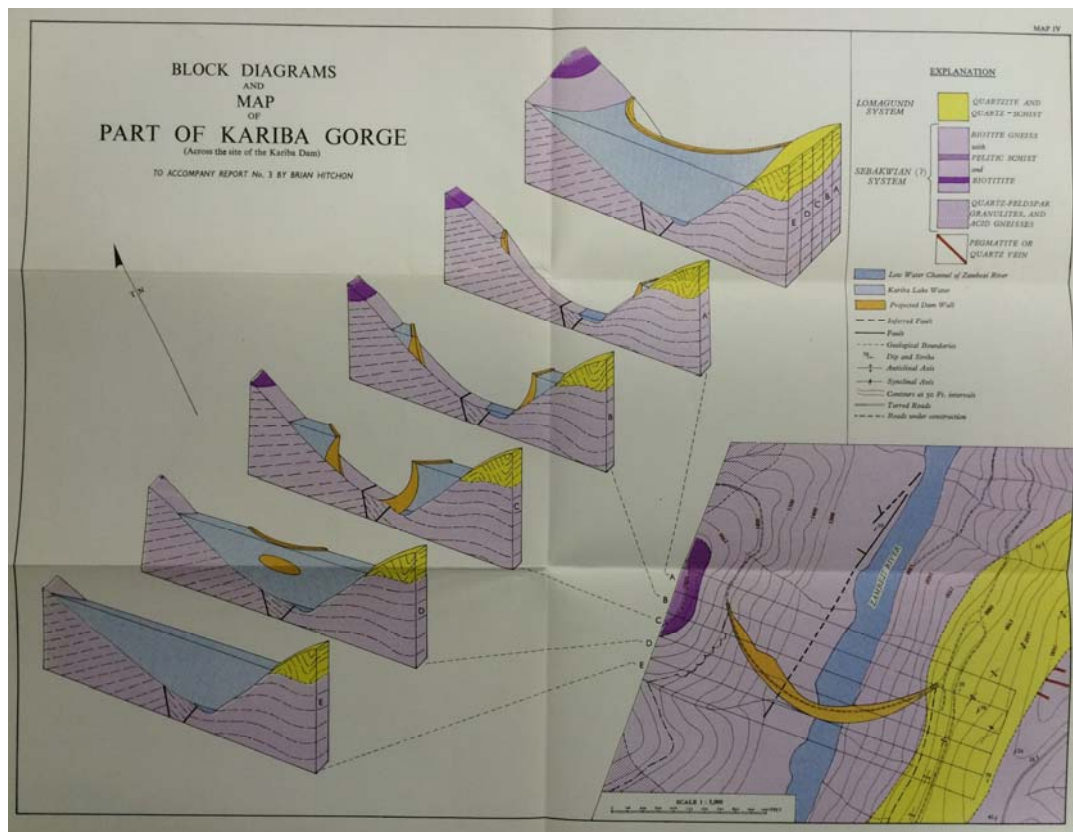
Geological plan and sections across the Kariba dam wall and abutments. Hitchon, 1958.
